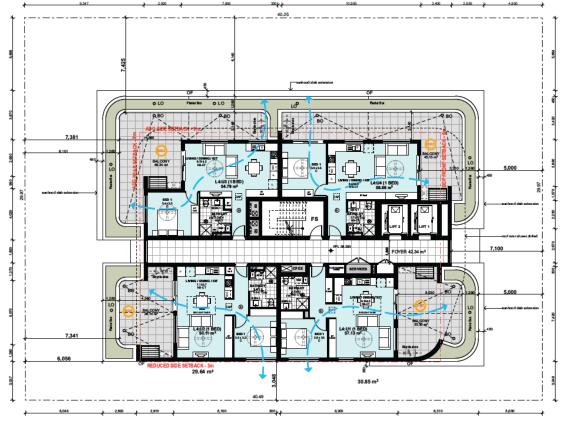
Level 4 Floor Plan. Source: DTA, [Revision A dated 26.02.2025
